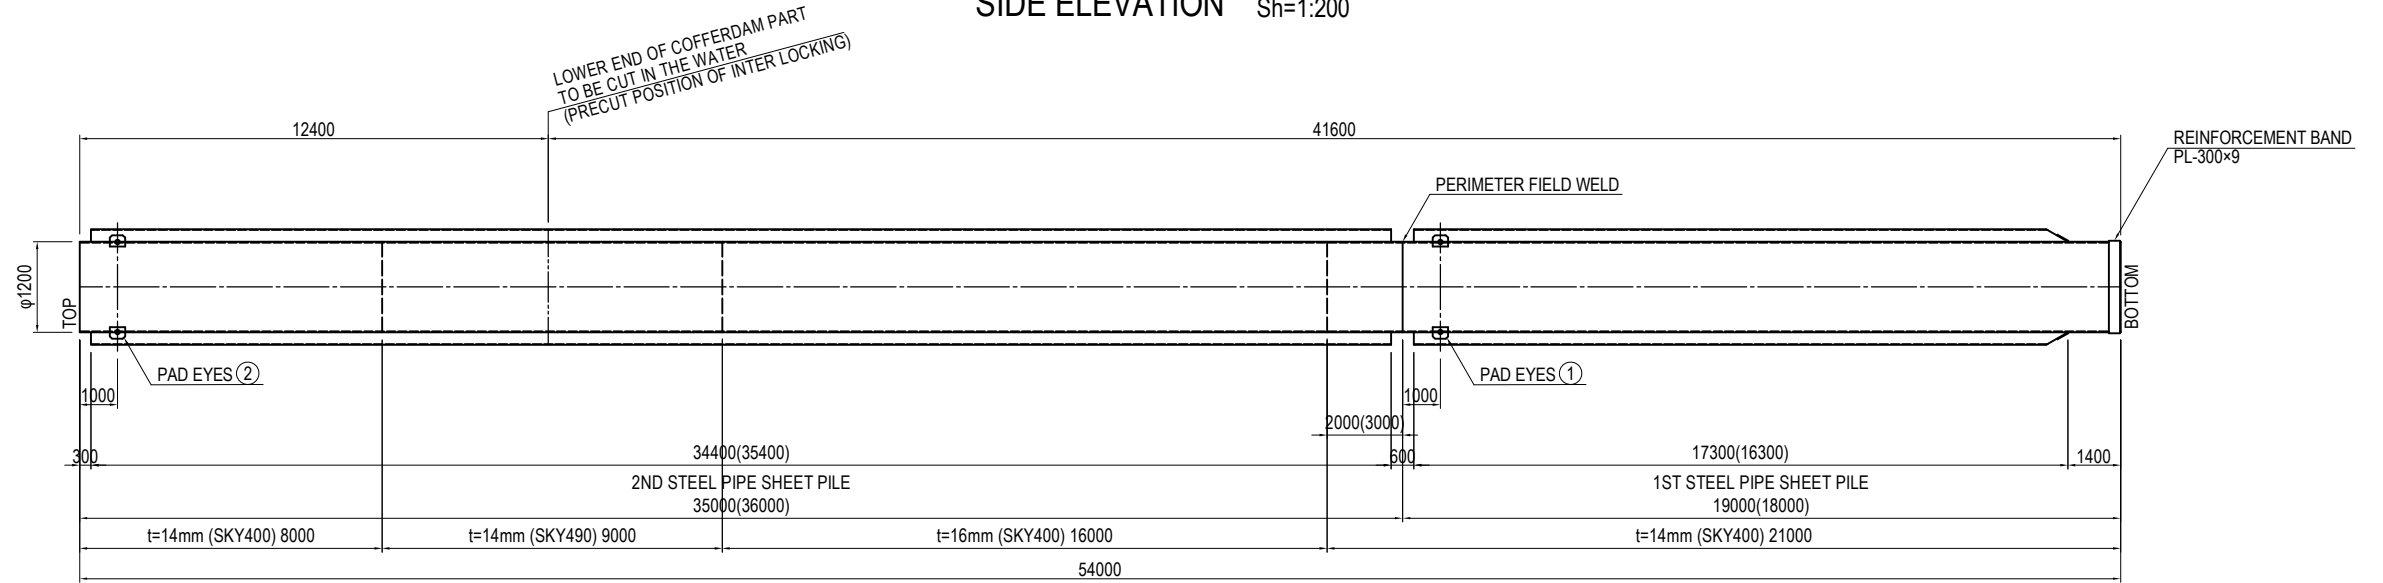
DETAIL OF STEEL PIPE SHEET PILE OF P14 PIER (2)
